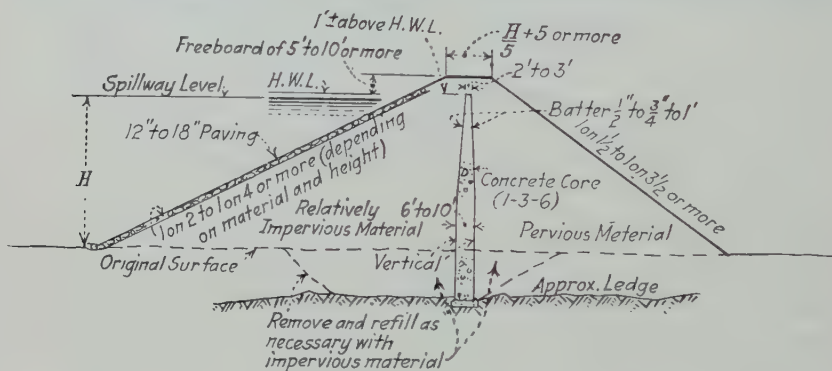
Earth fill dam with concrete core. Typical cross section.
